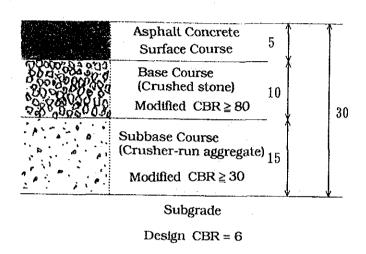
Optimum Design of Asphalt Pavement (New Construction)
